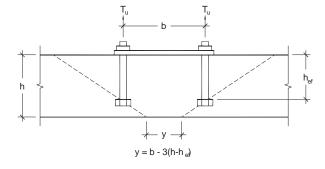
Breakout Cone for Group Anchors in Thin Slab
